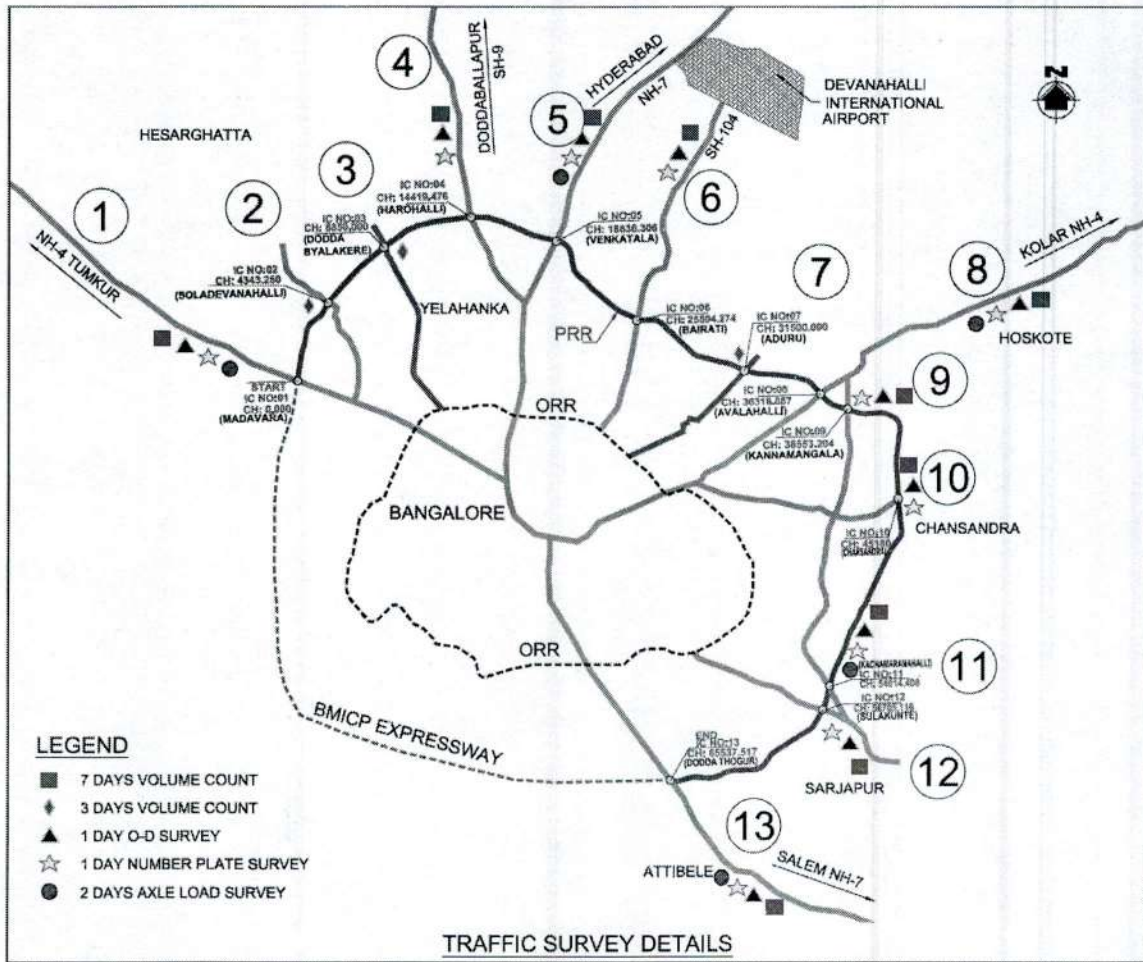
Key Plan showing Traffic Survey Locations (2018/2019)
